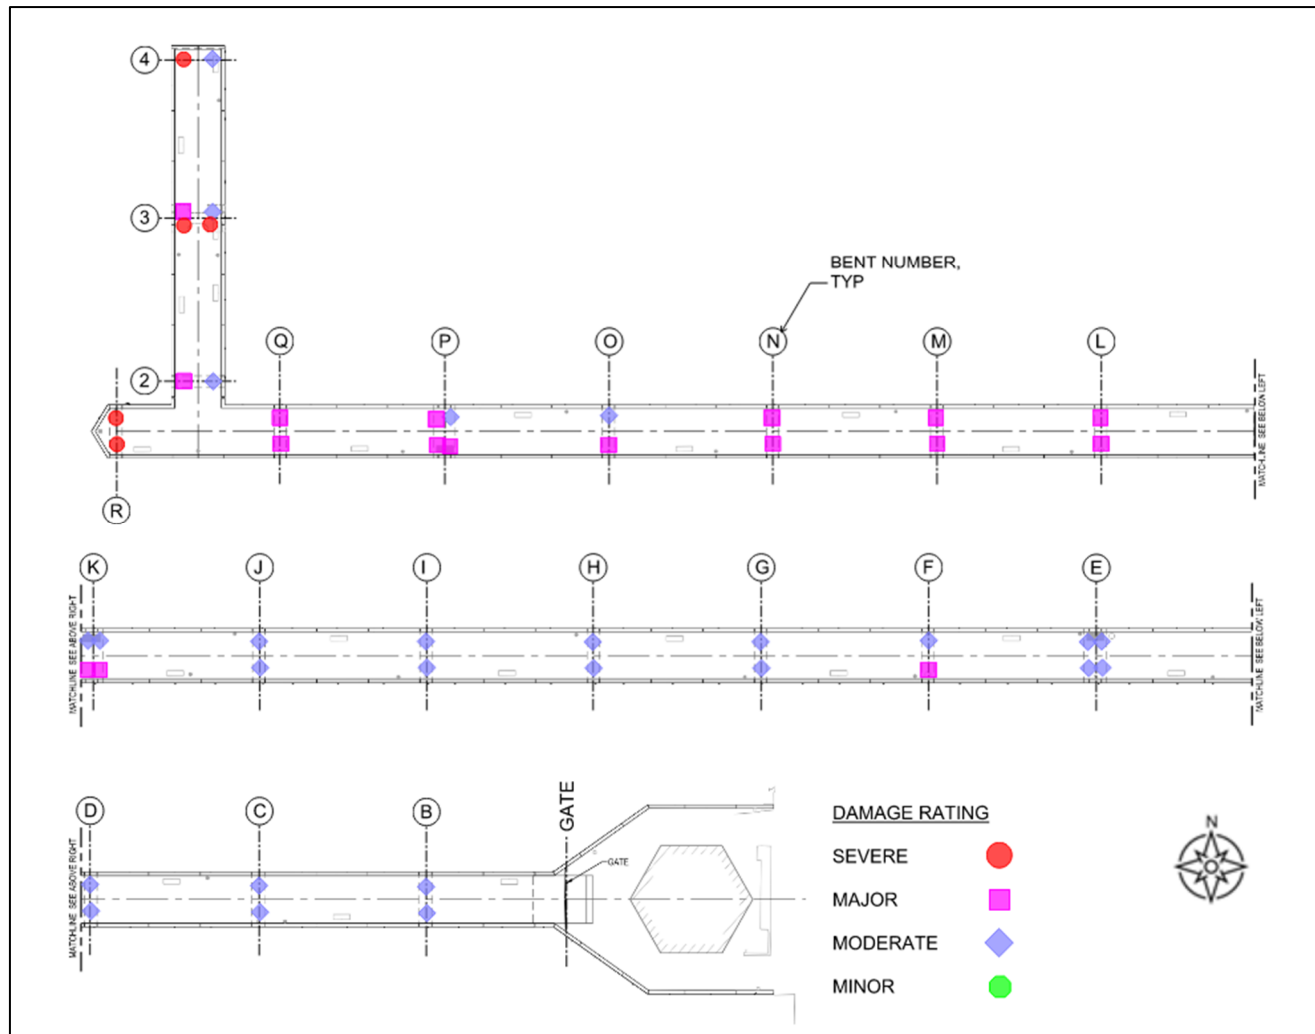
Damage Ratings – Piles, Above Water Observations 2024
